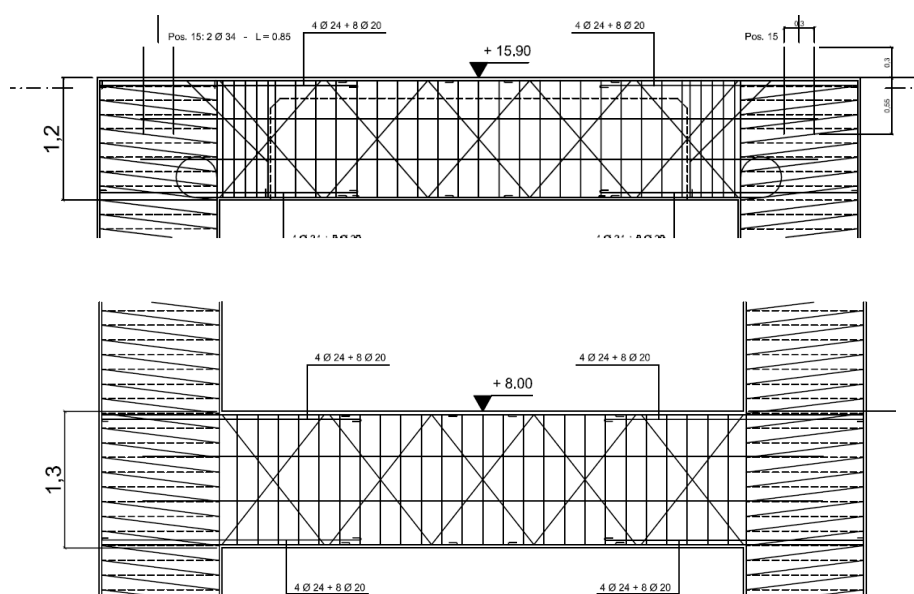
Reinforcement of cap and transverse beam of the tall pier
